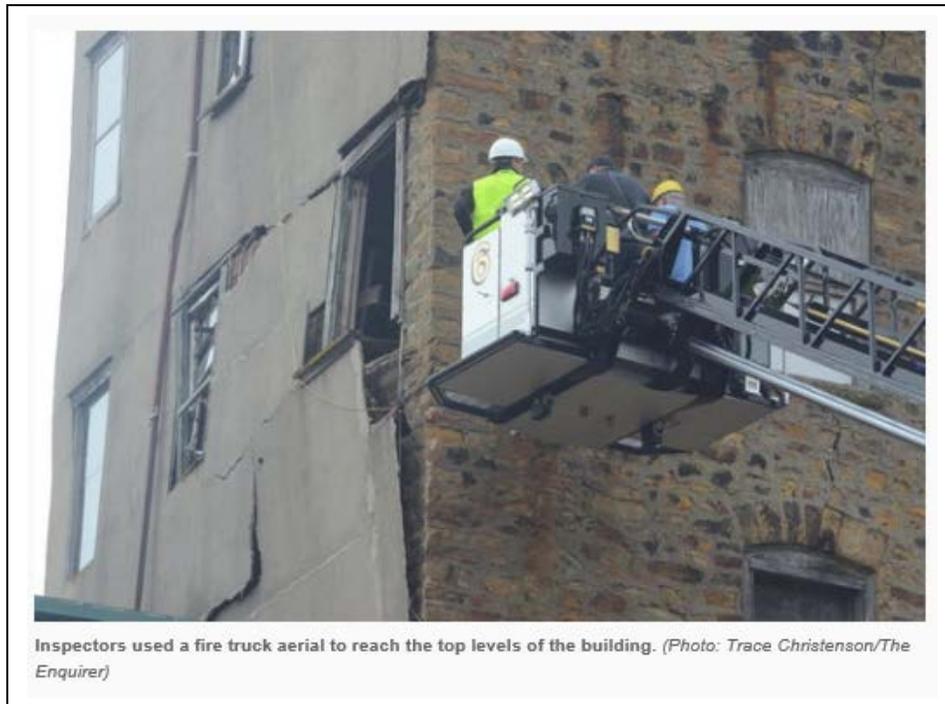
Photograph showing the buckling of the outer material of the back elevation near S. Monroe Street. Picture provided by Trace Christenson obtained from the Battle Creek Enquirer.
